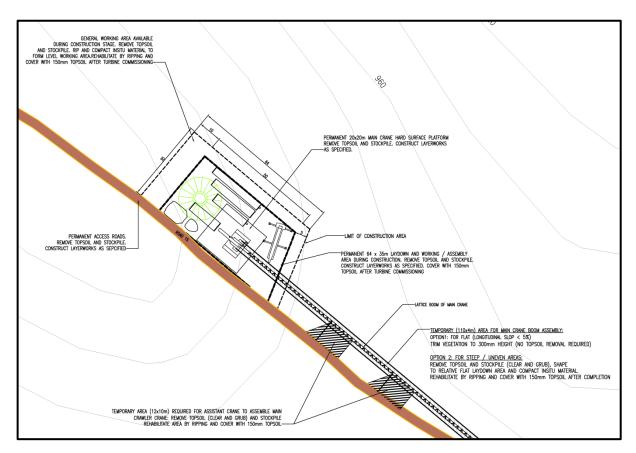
Sketch of wind turbine generator platform layout (see Appendix G for larger drawing)
